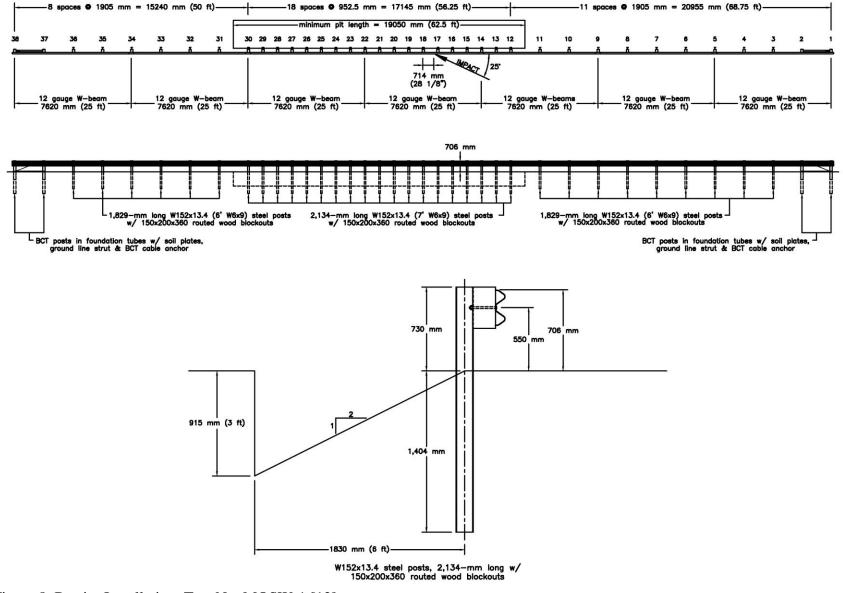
Barrier Installation, Test No. MOSW-1 [12]
